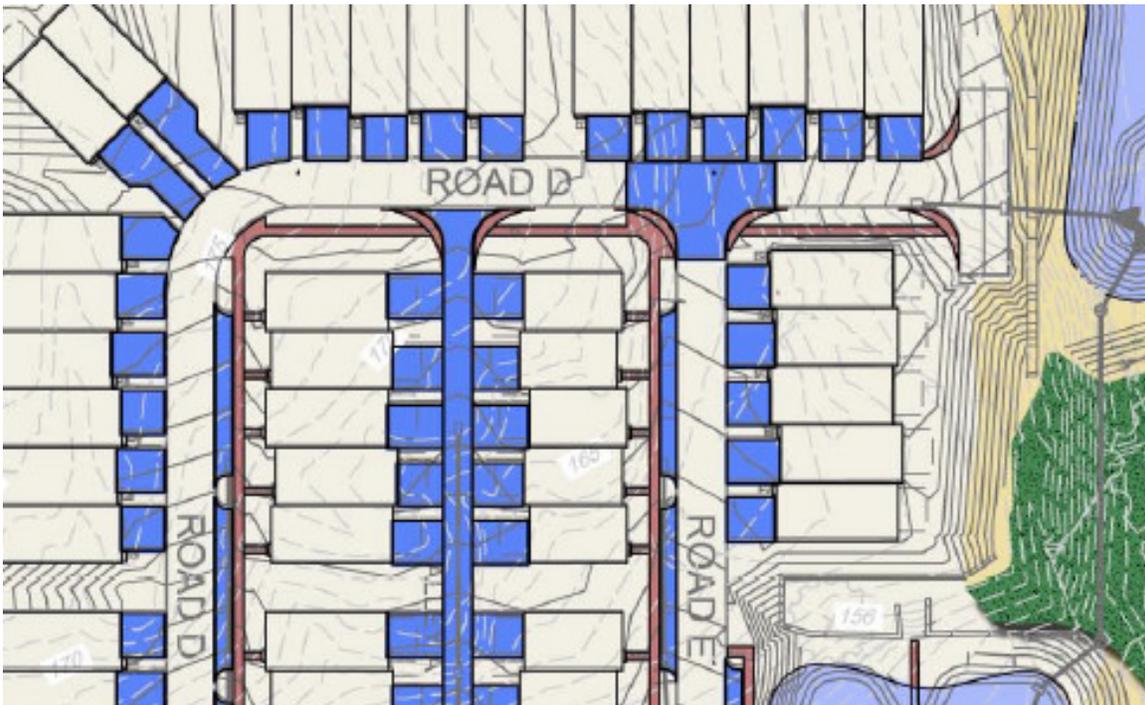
Screen shot of Overall Stormwater Plan showing reliance on Permeable Pavers.
